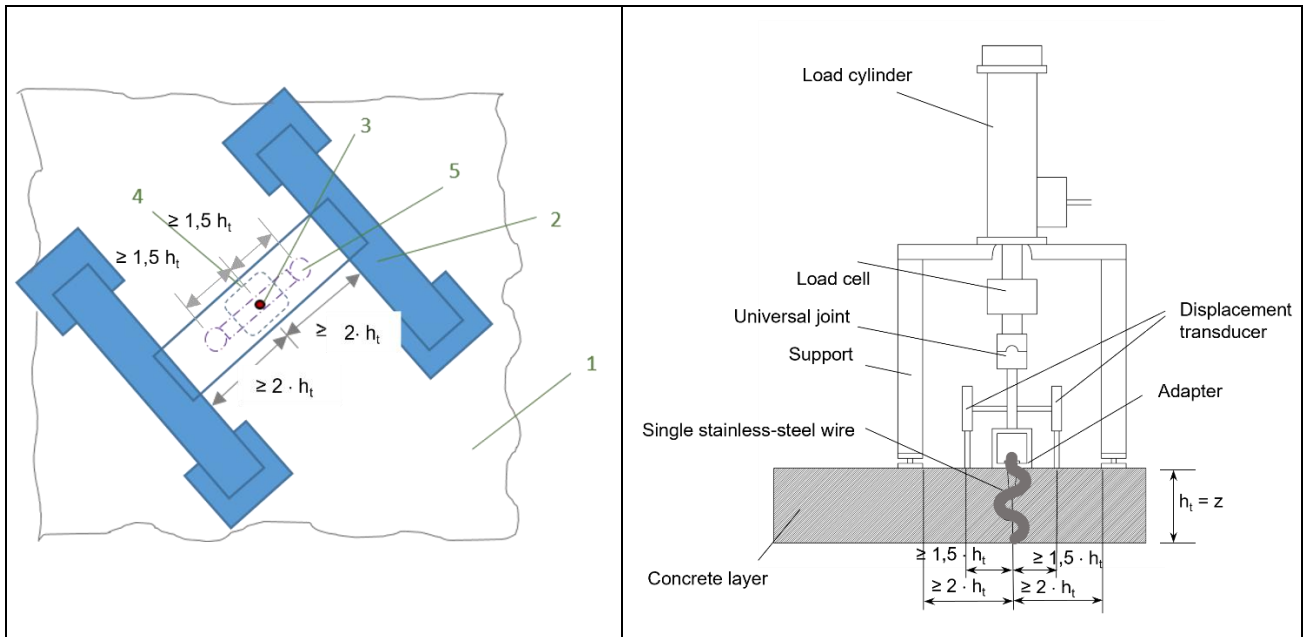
Example of the test rig for tension tests on single stainless-steel wire
